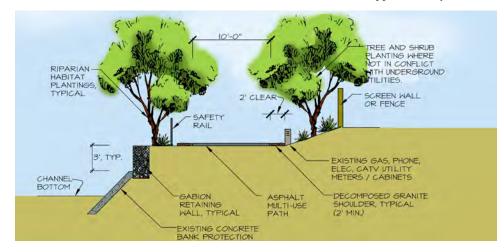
E: Typical Greenway Cross-Section Between Escalante Road and Stella Road
